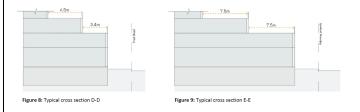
Extract of proposed DCP showing part of the building sections, with Fred Street being on the right hand side of the boundary.
